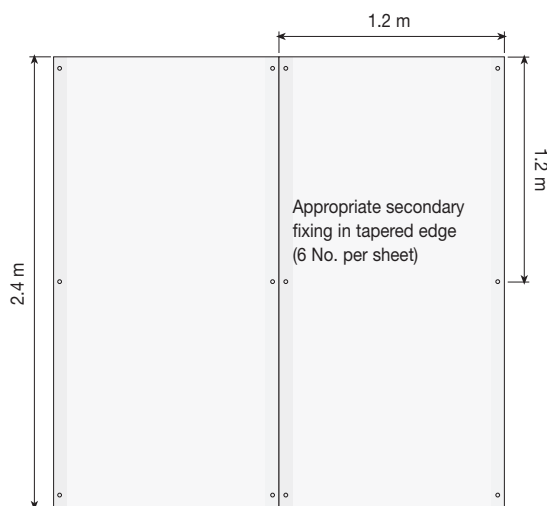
Appropriate Secondary Fixing Pattern for Drywall Adhesive Dab Bonding Using 6 Additional Fixings (See Figure 7 for the Appropriate Secondary Fixing Pattern when using 2 Additional Fixings)
